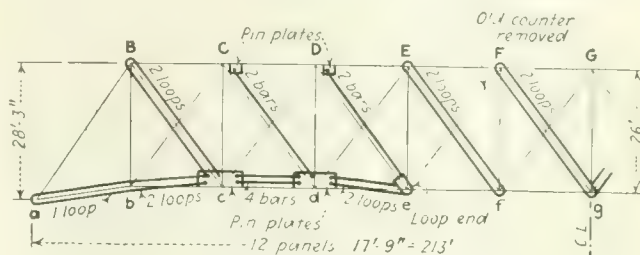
REINFORCEMENT OF MIDDLE TRUSS
